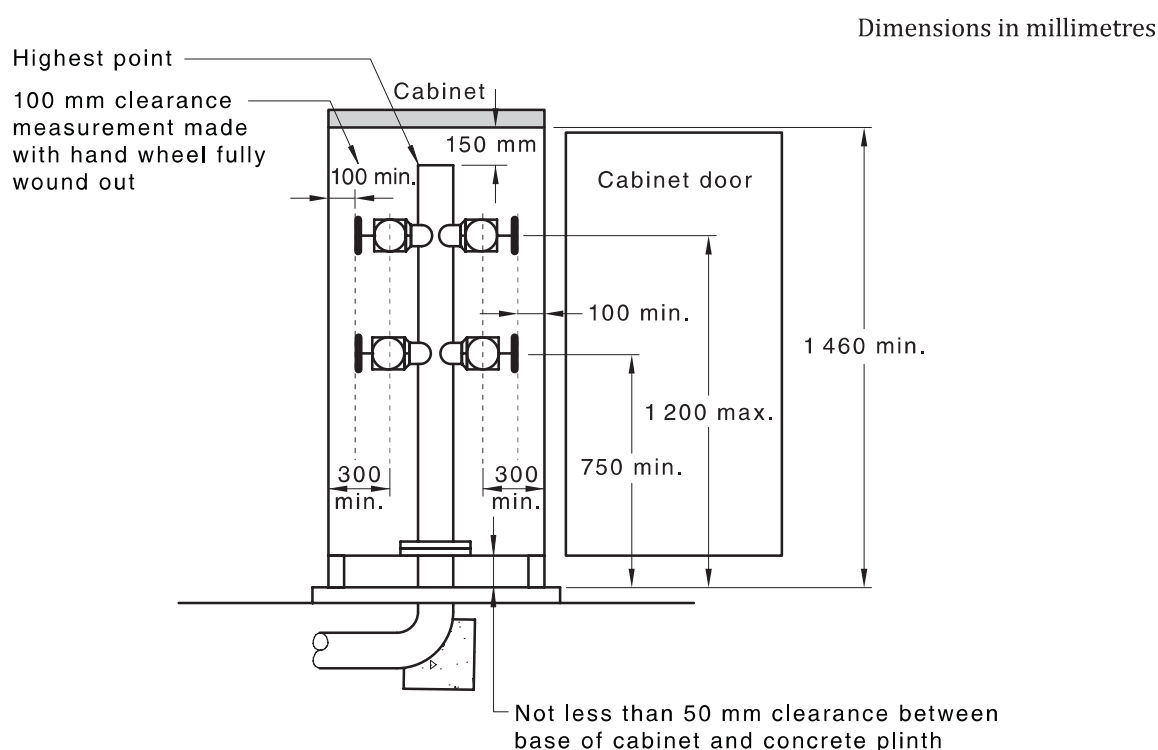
Clearances between firefighting equipment and the opening of a fire hydrant cabinet
